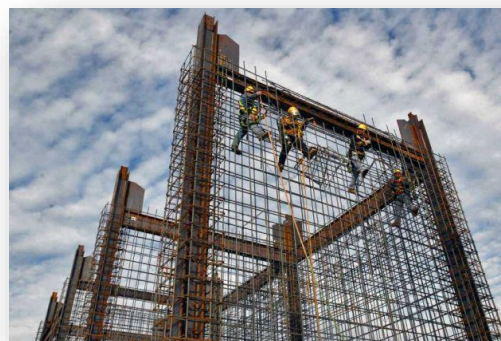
Reinforcement cage for a shear wall (Source: www.researchgate.in)
